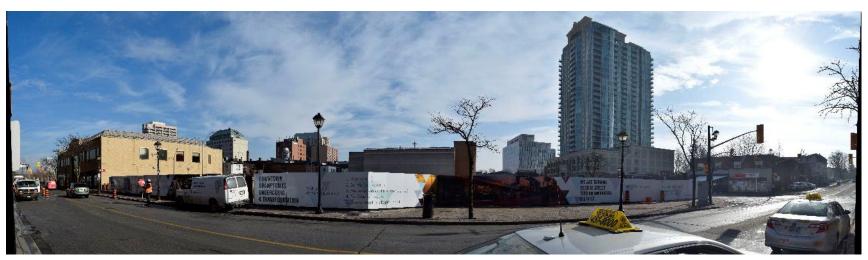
Composite overview of 21 Nelson Street West (centre of image), facing east
